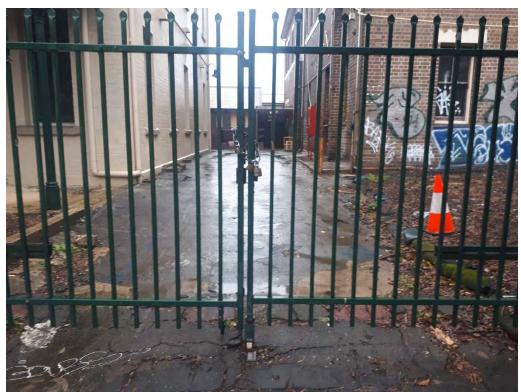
Entrance on the Western end of the site. Photo taken from Wilson Street.
